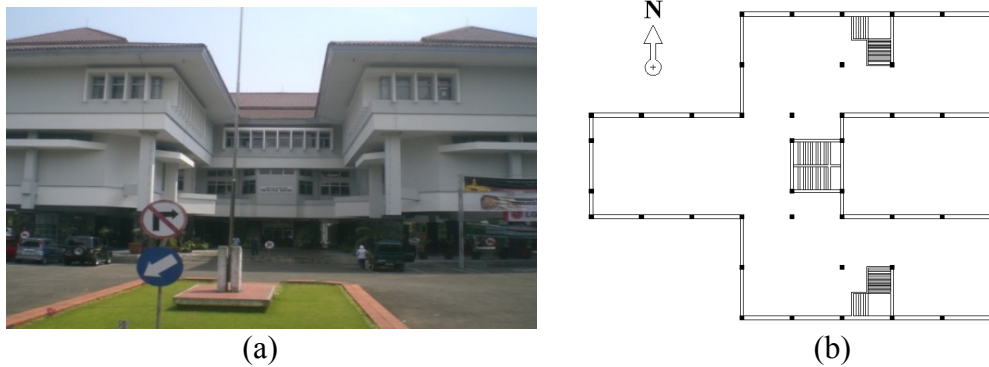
Plan view of Y-building of Faculty of Engineering of GMU
